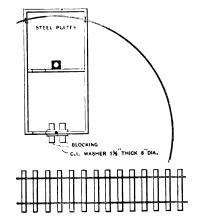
Plan of Building, Showing Method of Swinging It Round to Track.--Scale, 1-16 In. to the Foot.
